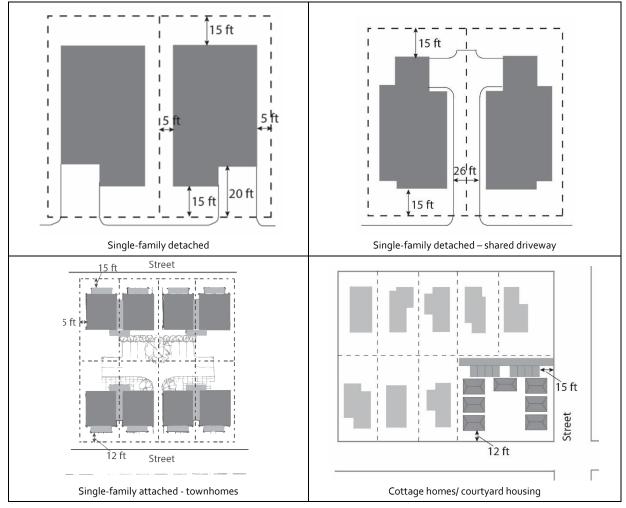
SETBACKS AND DRIVEWAY STANDARDS BY BUILDING TYPES
